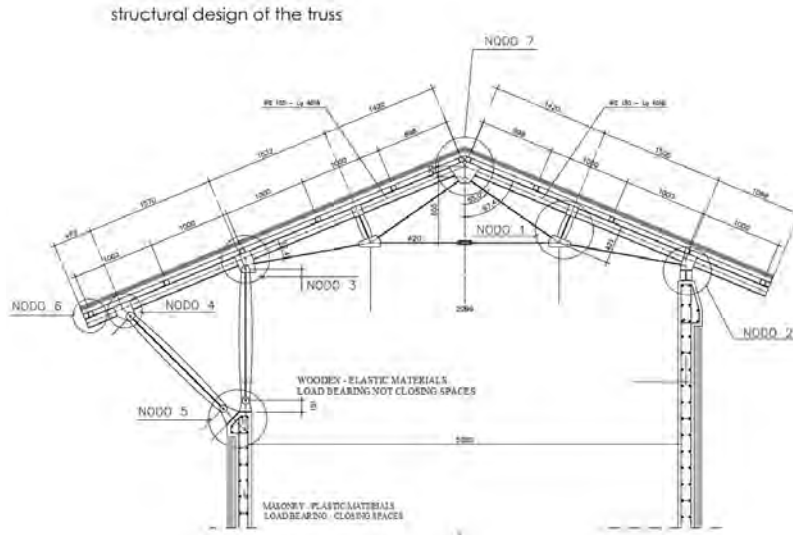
Structure of the architectural “conclusion band” of the building, light, transparent, load bearing and not closing spaces resting on the masonry structures, massive, opaque, load bearing and closing spaces.
